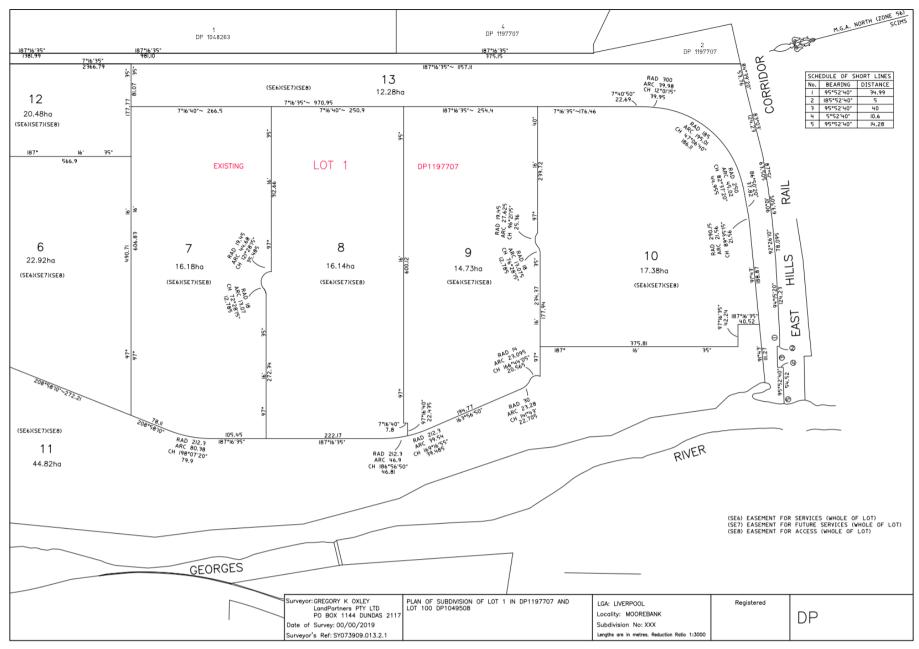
| Proposed draft plan of subdivision of existing lot 1 in DP 1197707 including lot dimensions – Sheet 03 of 03 (Source: Applicant's RtS)
